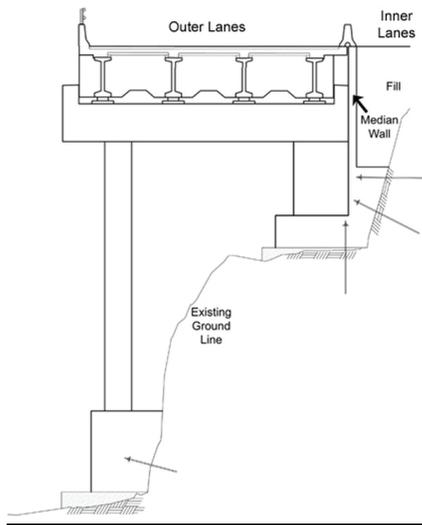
Typical Half-Bridge Cross-Section (6900 Structure)
